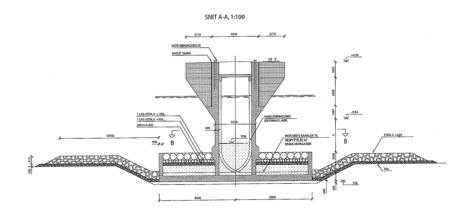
Diagram of site preparation and foundation of concrete gravity foundations used at Nysted wind farm.¹¹¹
